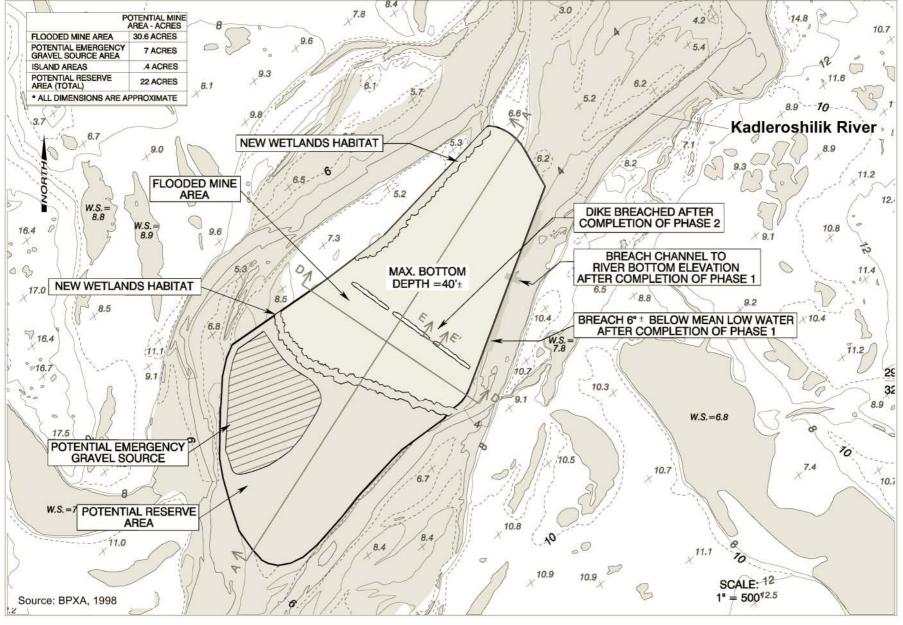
Proposed Kadleroshilik River Mine Site - Rehabilitation Plan - Plan View
